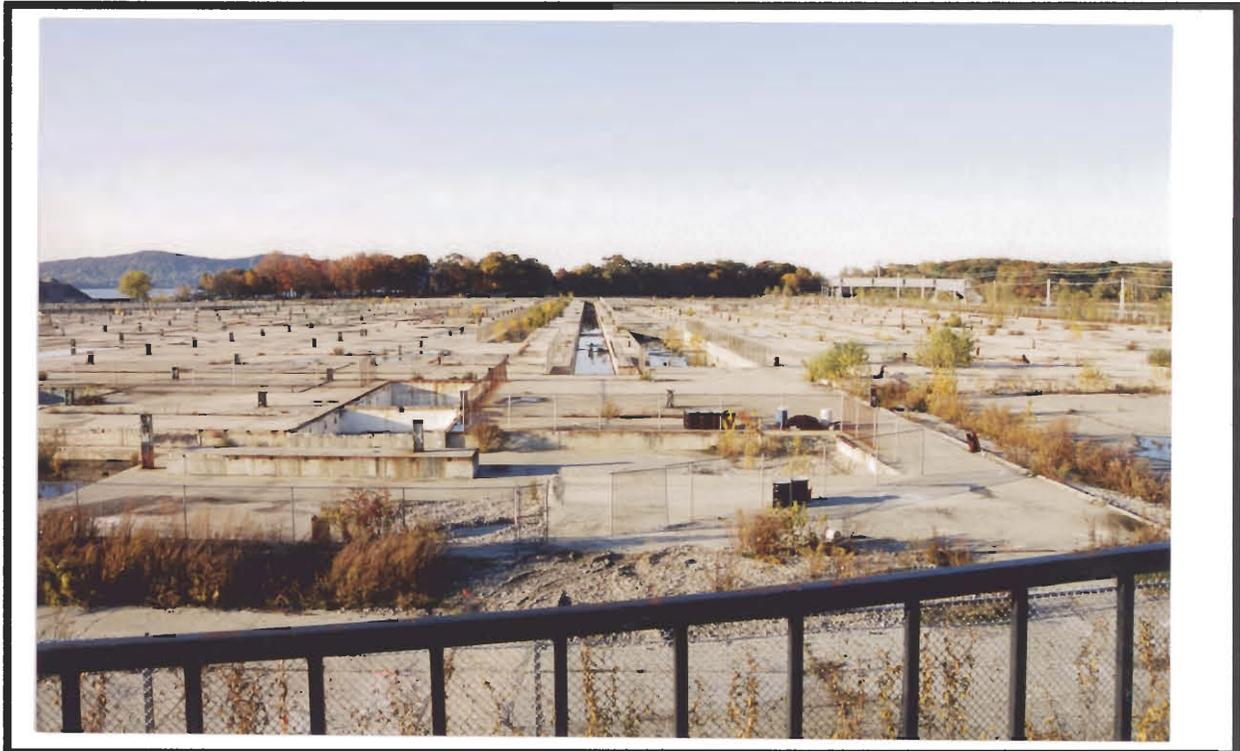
View north across site from Beekman Avenue. Large areas of the site were formerly occupied by Chevrolet Motors Company Plant No. 2. Building was 1-story. When plant was demolished, the beams supporting the roof were cut off, leaving ground floors and basements. Kingsland Point Park is in background.
